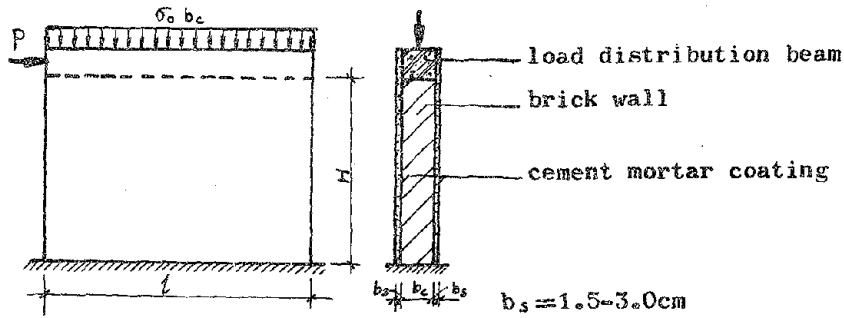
Brick wall strengthened by cement mortar coatings attached to the wall surfaces
